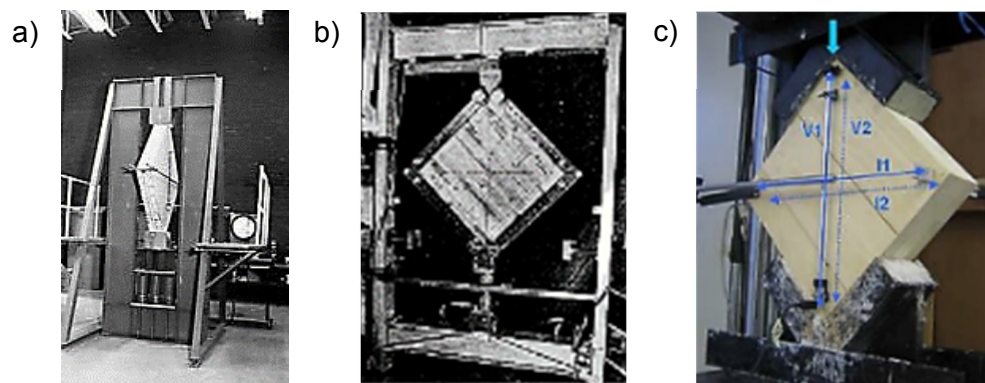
a) Diagonal tension test for masonry specimens -picture taken from (ASTM, 2002); b) Picture frame test of layered timber shell elements - picture taken from Moss & Walford (1976); c) Diagonal compression test for determining shear modulus -picture taken from Dujic *et al.* (2007).
